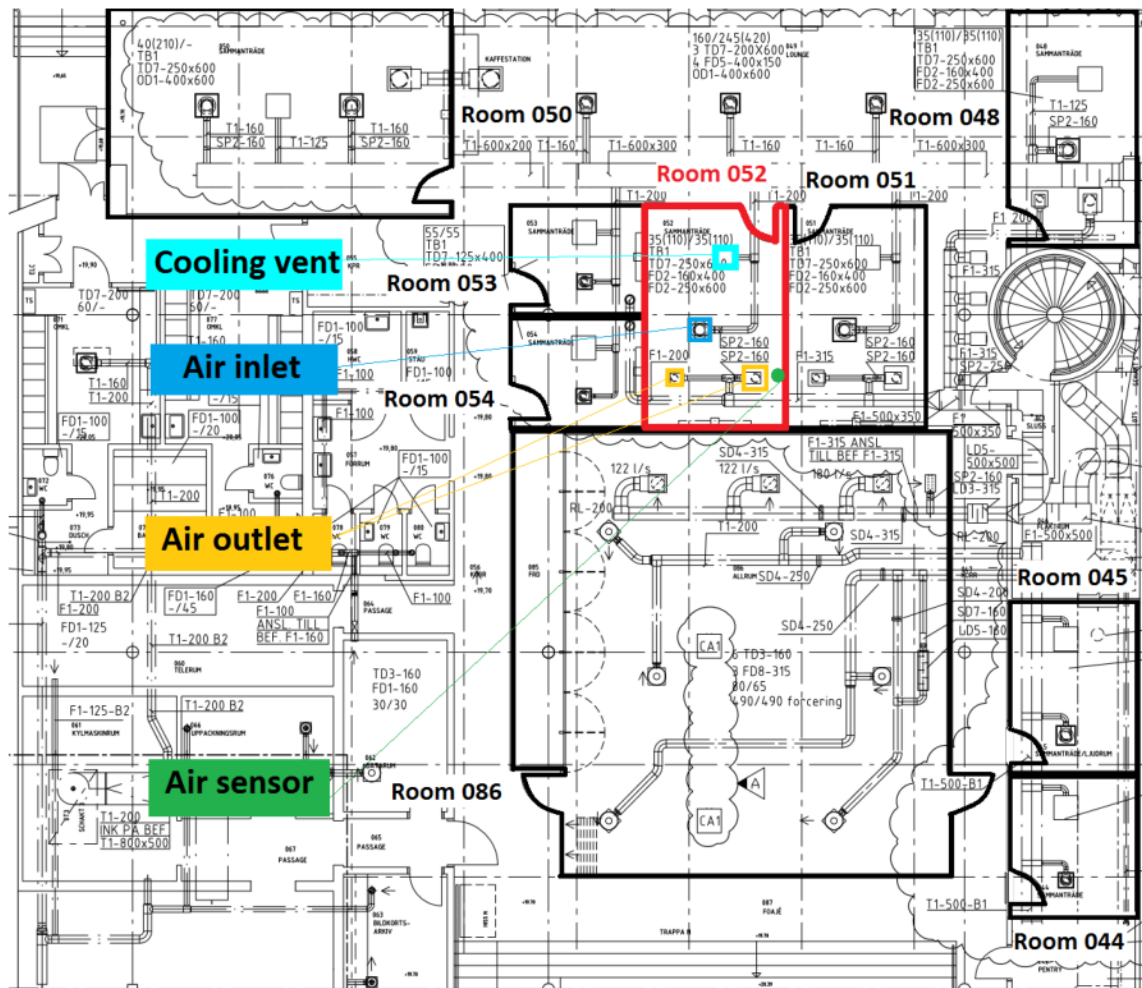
Air Sensor Positioning to Inlets, Exits, and Vents on the 0th-Floor Plan. Reprinted from (Nguyen, 2016).
